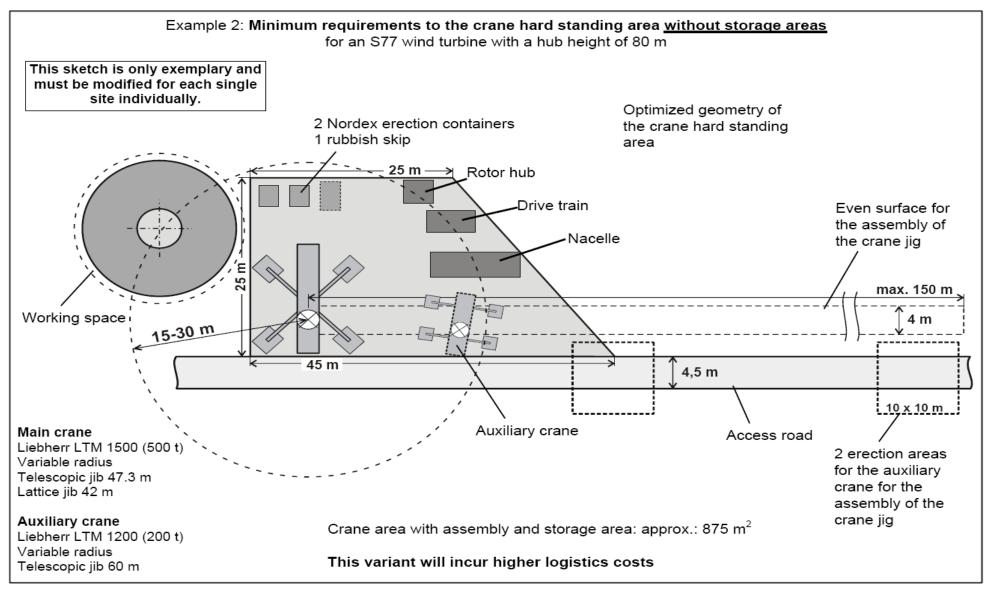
Illustration of the floor plan for the crane hardstanding area
